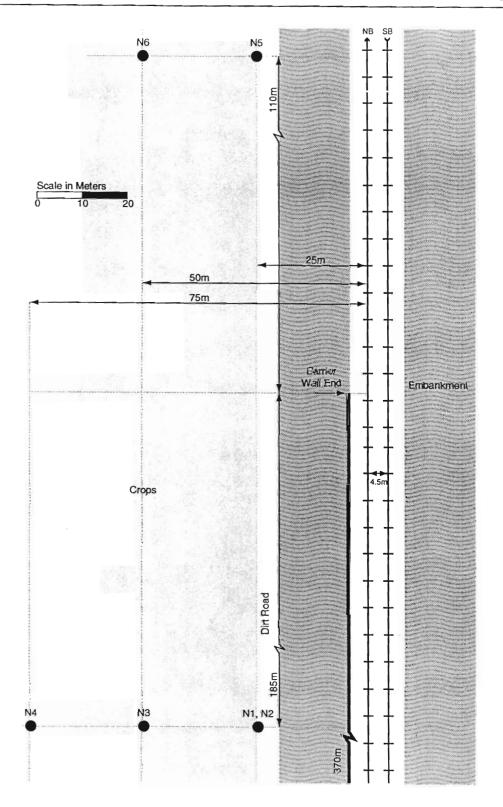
A. PLAN VIEW OF FRENCH MEASUREMENT SITE H
